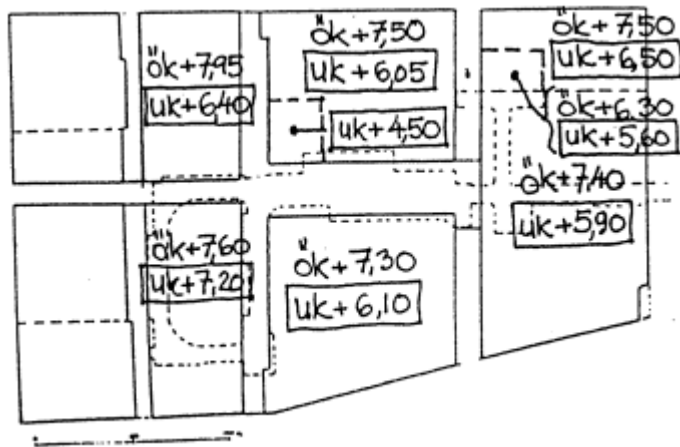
Rough sketch of raft levels for the buildings of Nordstan shopping centre (Svensson, 1993).
